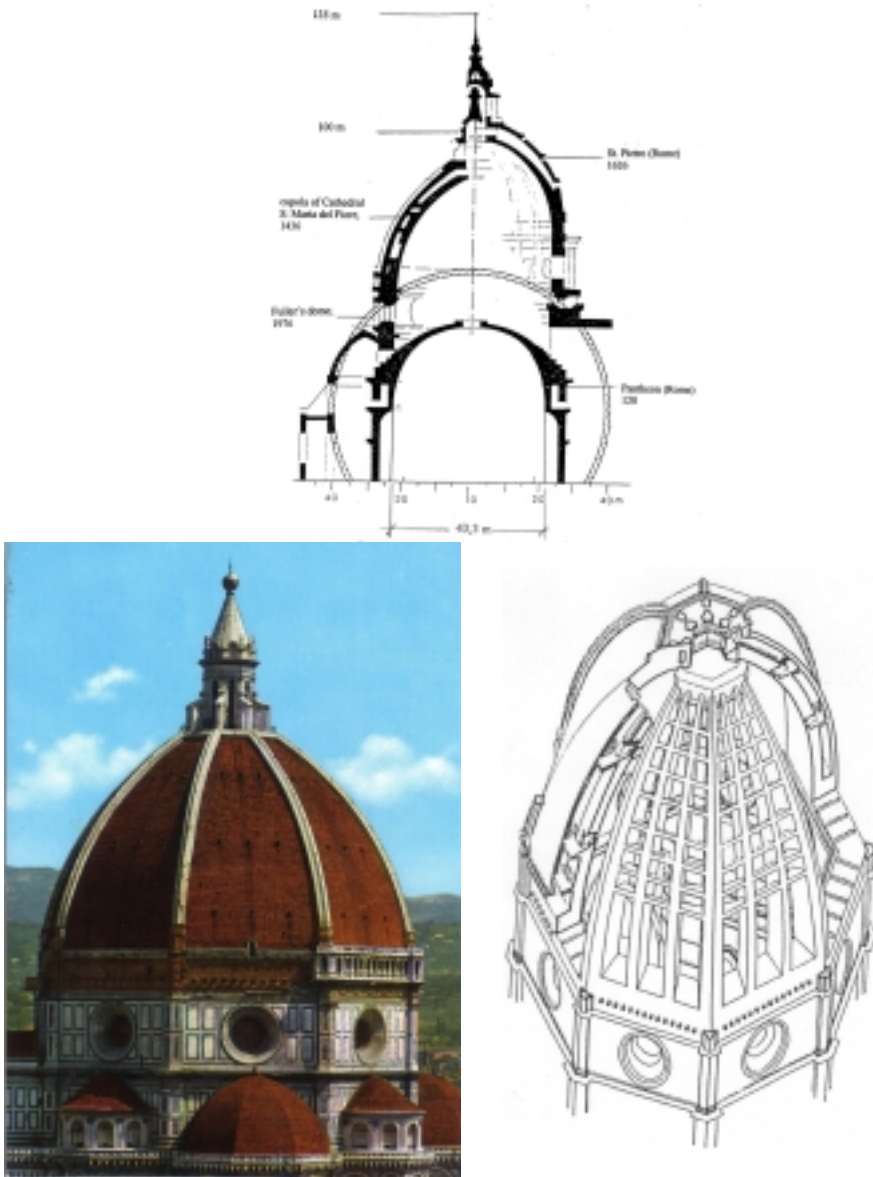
Historic domes: A) Sections of famous domes (PORR. Nachr. 1987) B) Picture and structural drawing of the dome of the Cathedral in Firenze (Sta Maria del Fiore)
